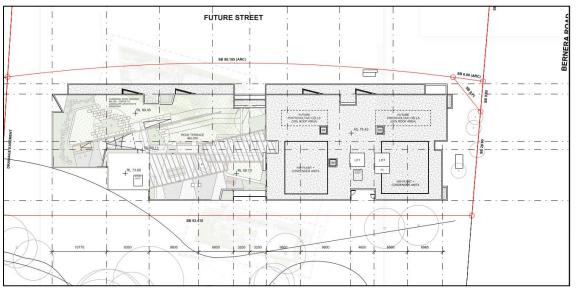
Building C Roof Plan (Source: Stanisic Architects)
